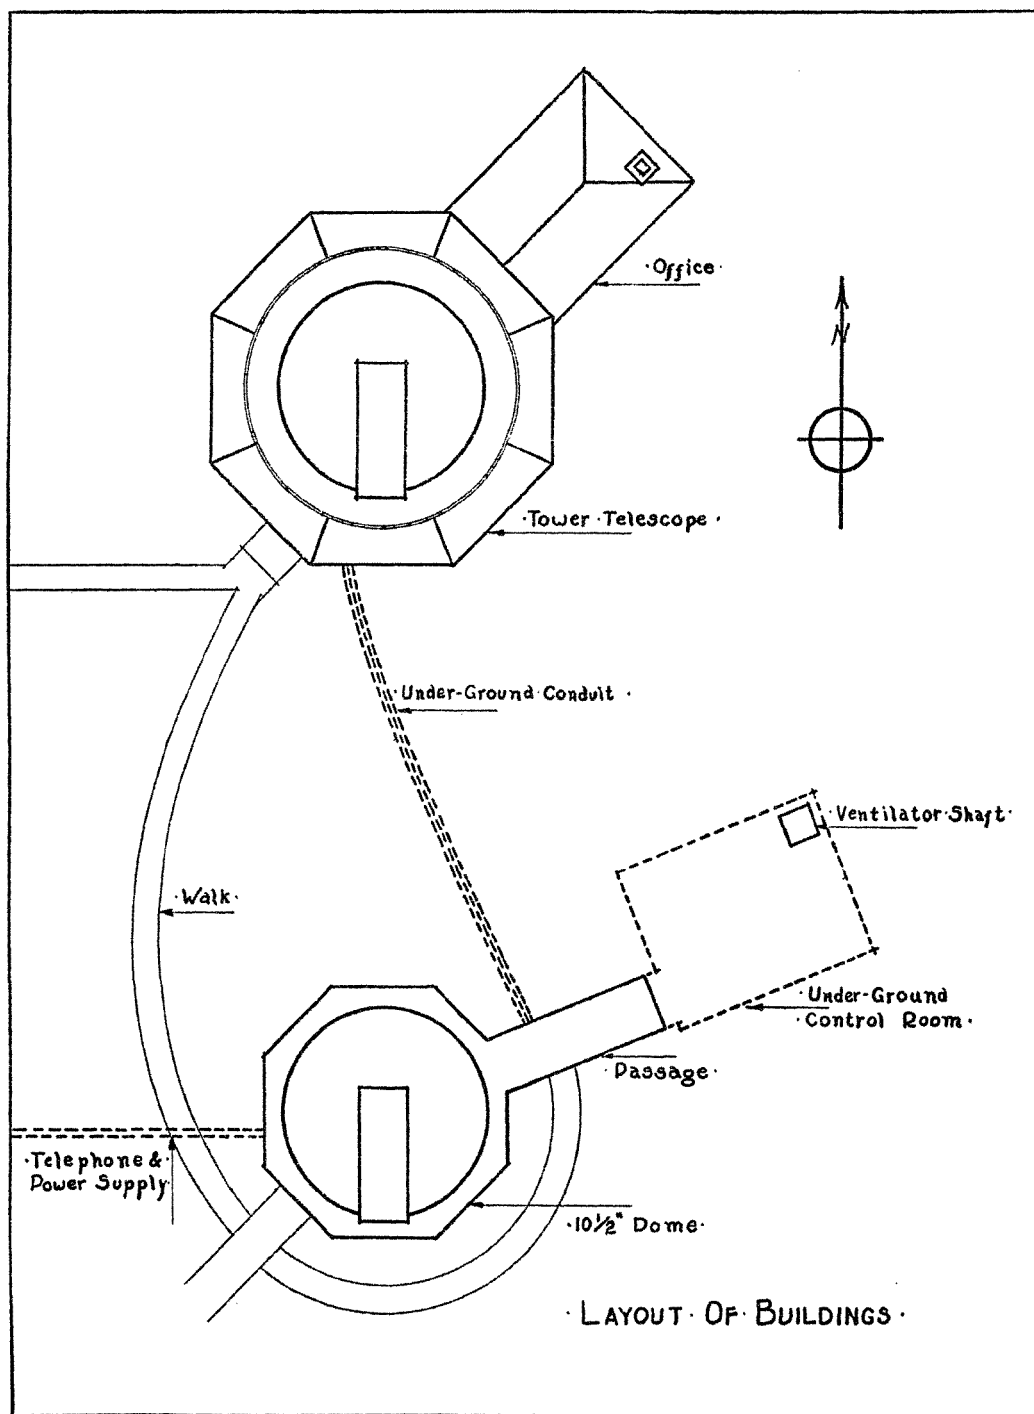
Layout of Buildings of the McMath-Hulbert Observatory.
